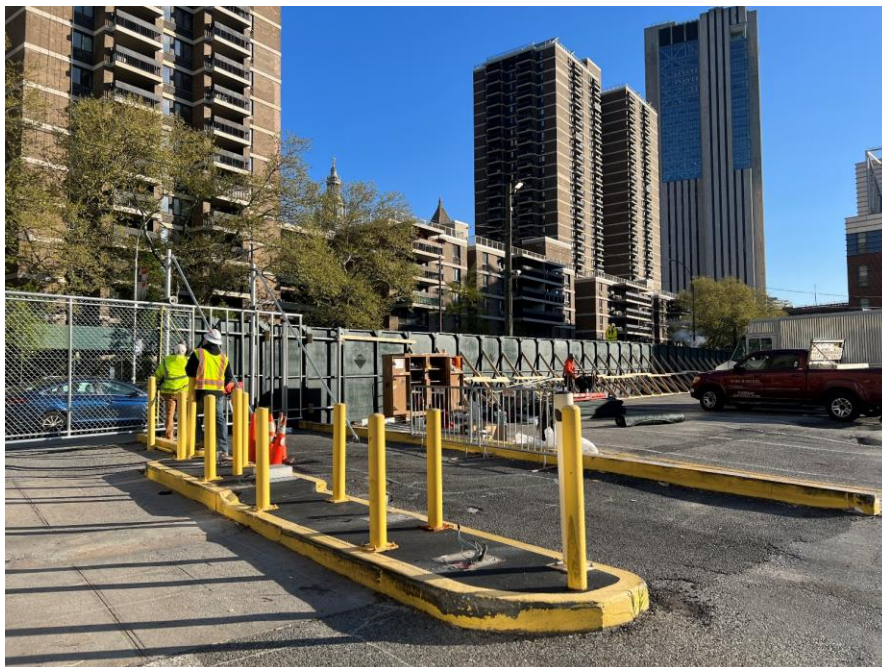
View of UBS installing the perimeter construction fence along the northern perimeter of the site (facing northeast).
